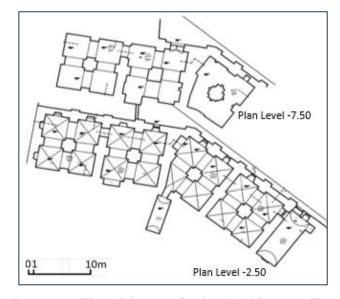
Basement Floor Plans restitution Architecture Foundation, 2010 (archive of DGF)
